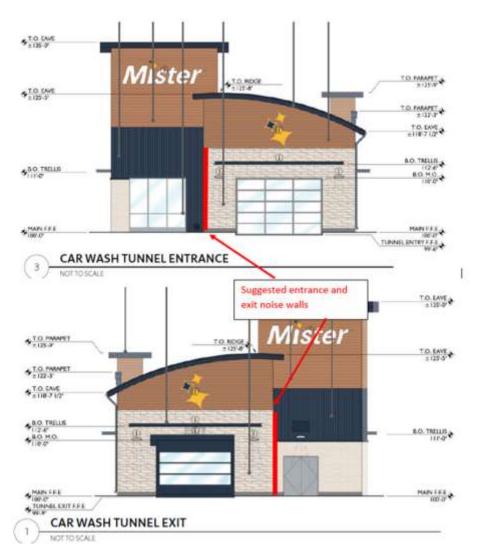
SUGGESTED WALL LOCATIONS
